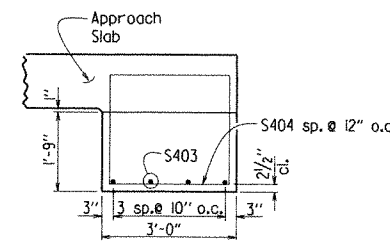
DETAILS OF LONGITUDINAL CONSTRUCTION JOINT
